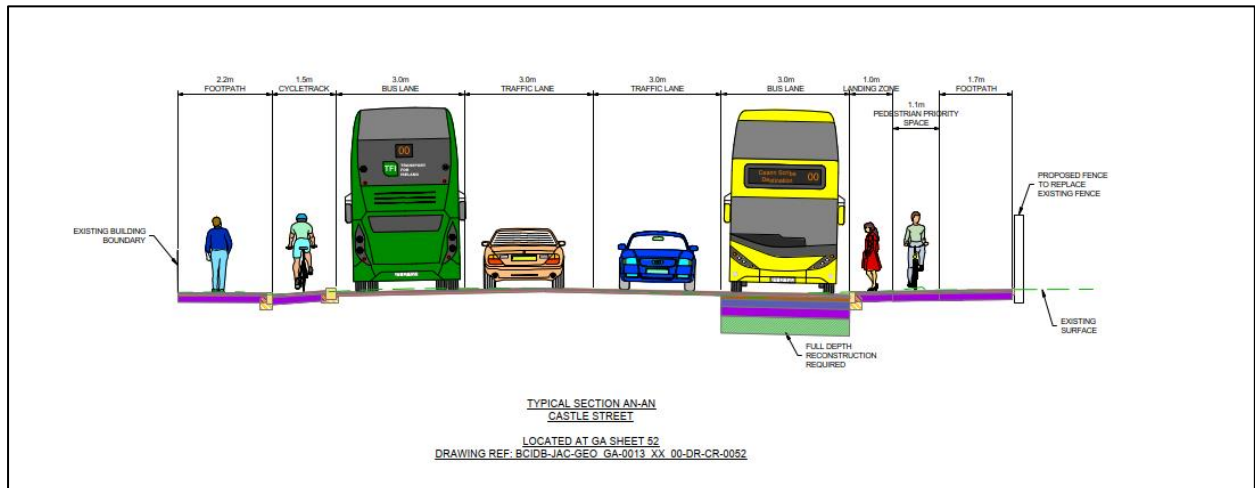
Extract from Typical Cross-section Drawing (Sheet 22)
